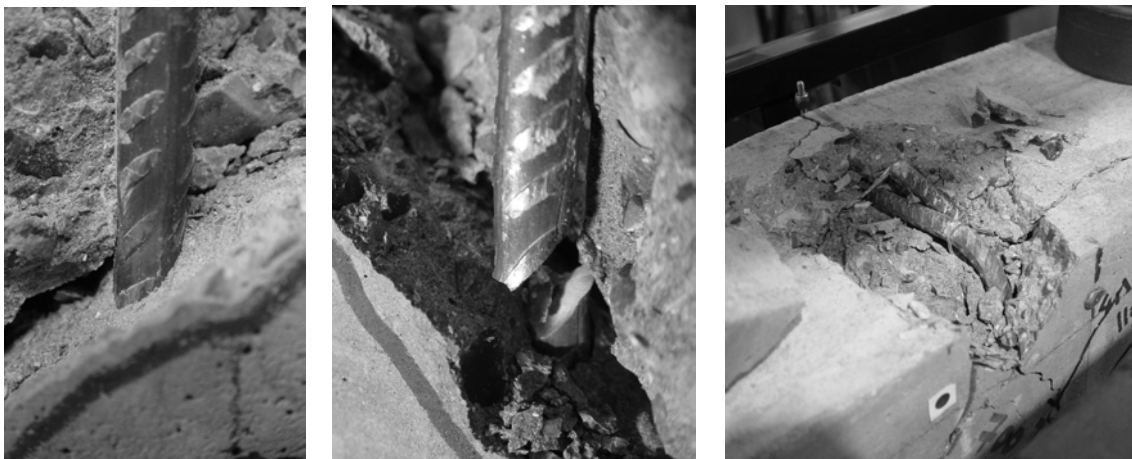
Left-* necking of stirrups; *Centre-* fracture of stirrup; *Right-* spalling of concrete cover due to anchorage failure of stirrups
